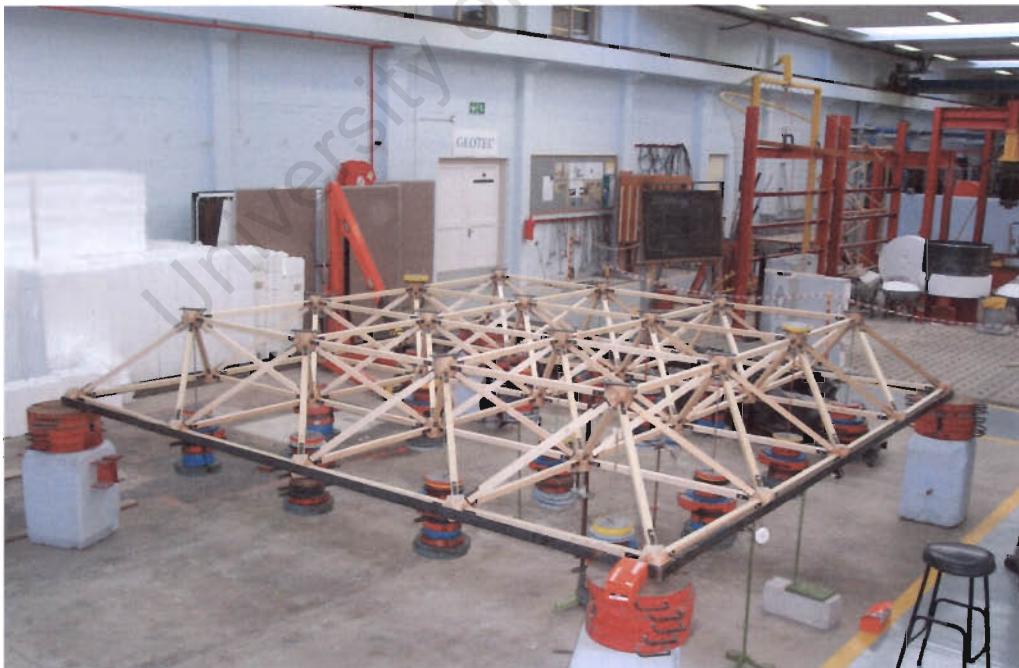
Laboratory testing to failure of a double-layer flat space grid of machined timber members
